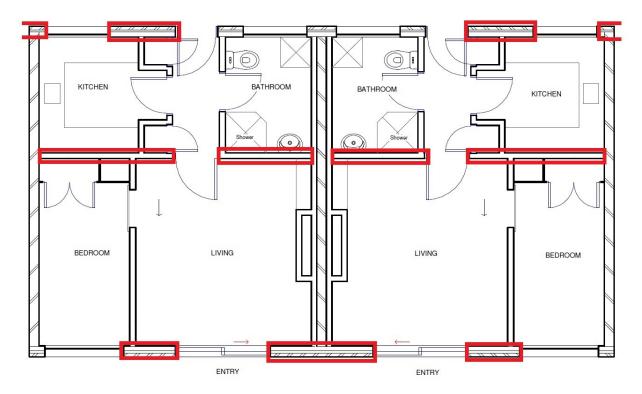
Walls used for bracing in the longitudinal direction (Units 1-25).
